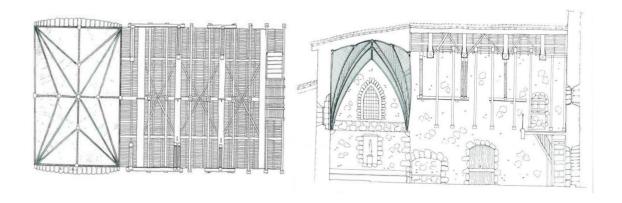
Plan and longitudinal section of the church. Source: Ars Lignea (Santana, 1996)
